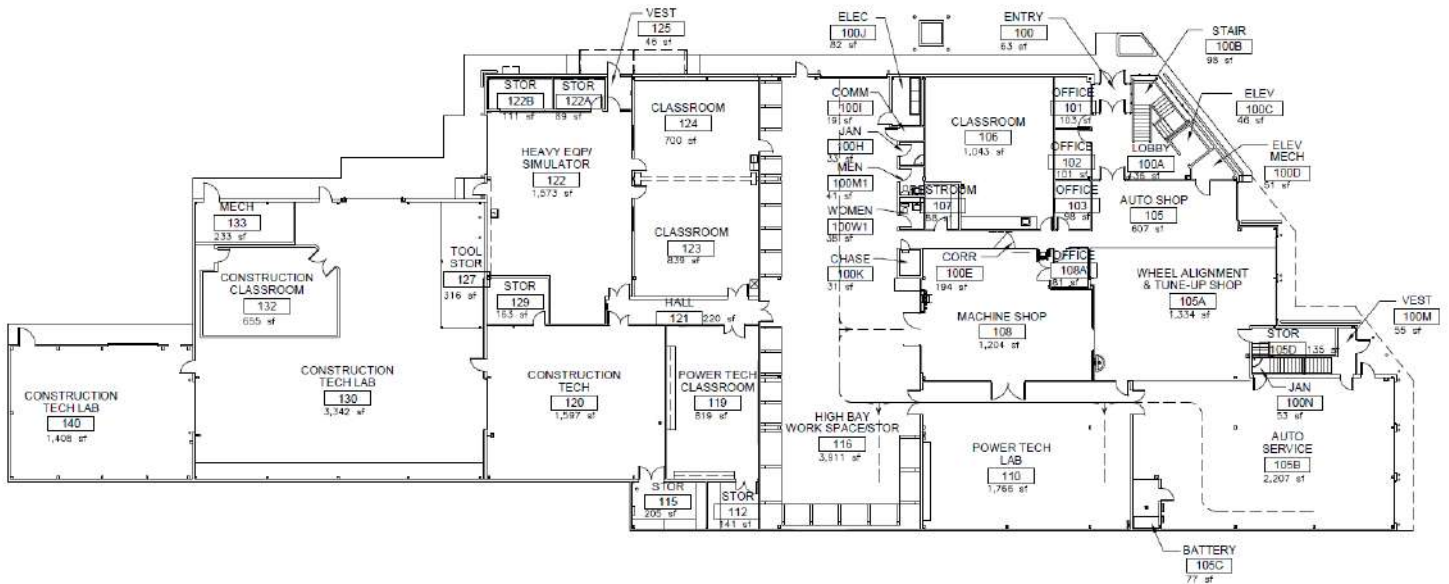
TEC building layout as shown by excerpts from drawings, first floor layout
